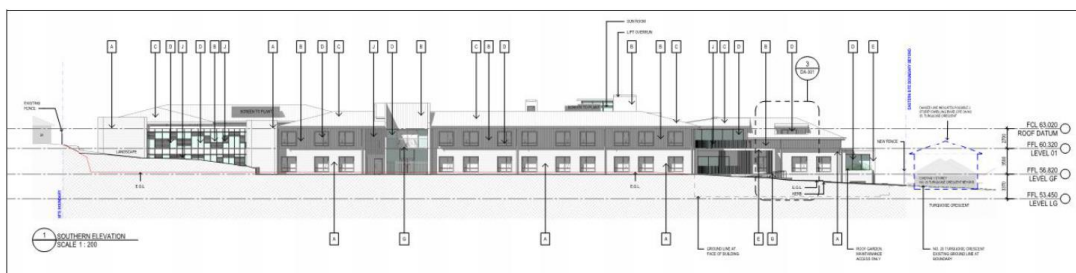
Southern Elevation (Source: Jackson Teece, 2019)
